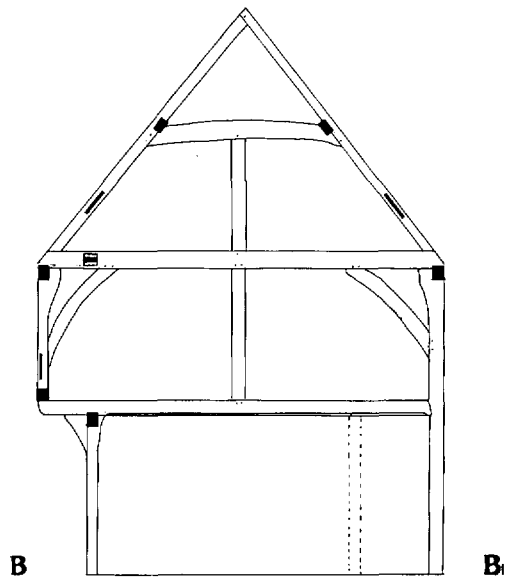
Cross sections of 11-13 Chantry Street, Andover.
